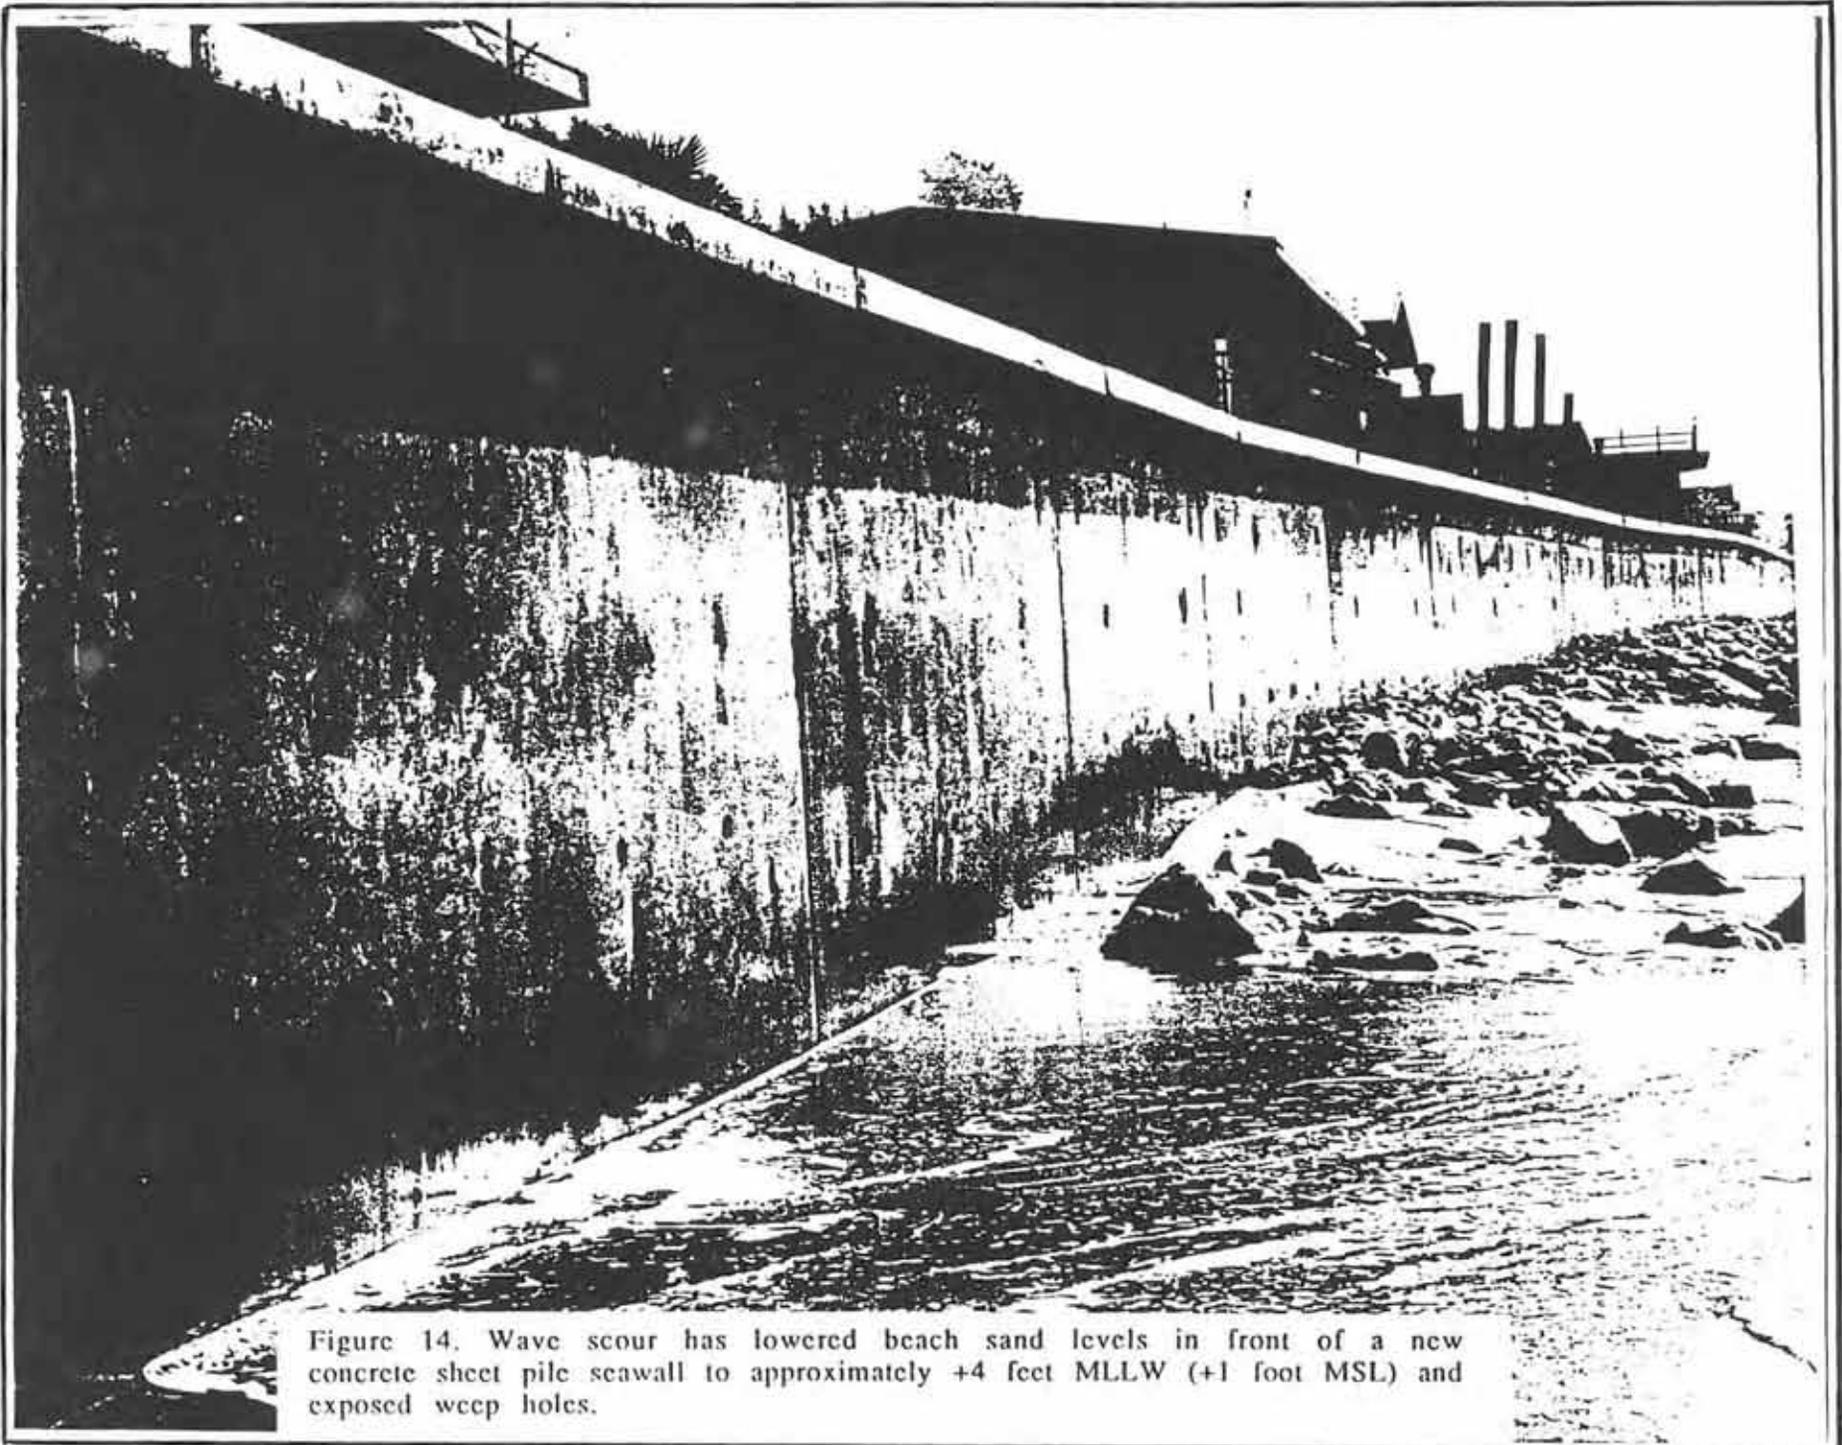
Wave scour has lowered beach sand levels in front of a new concrete sheet pile seawall to approximately +4 feet MLLW (+1 foot MSL) and exposed weep holes.
